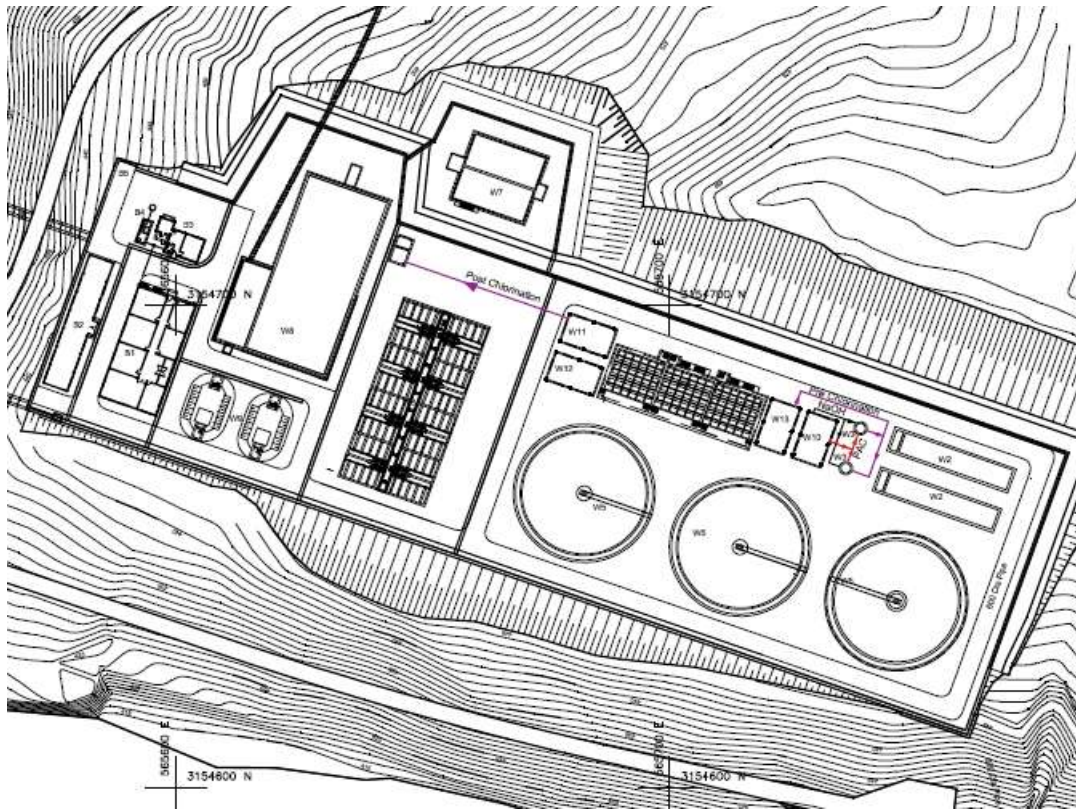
Layout of Water Treatment Plant Plan of Bheri-Pumping Sub-Project (Package-I)
